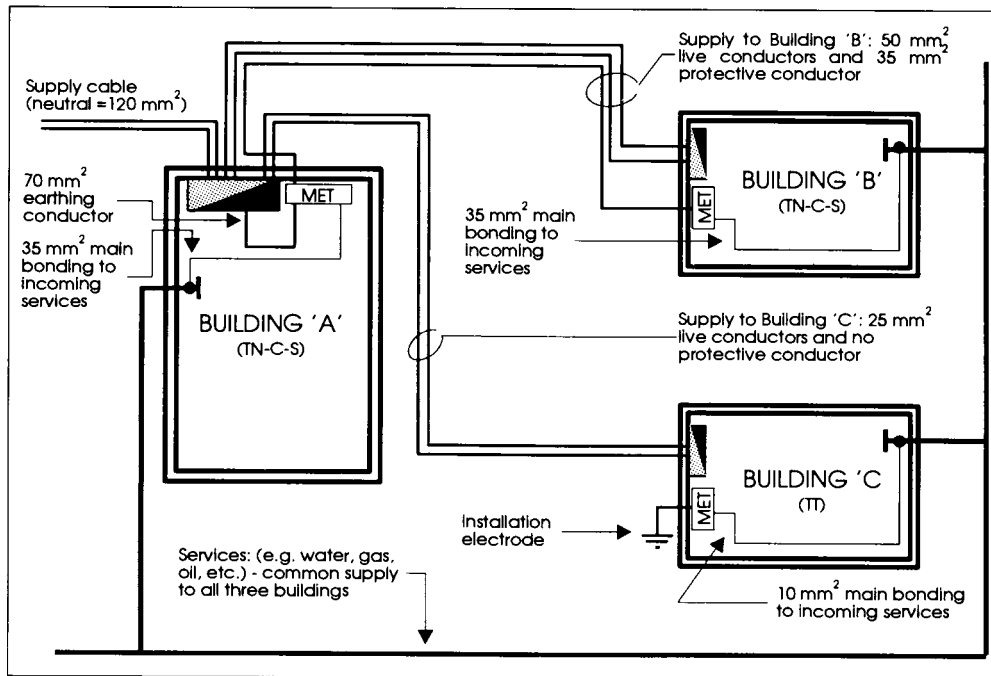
Typical arrangement for one installation spanning three separate buildings
